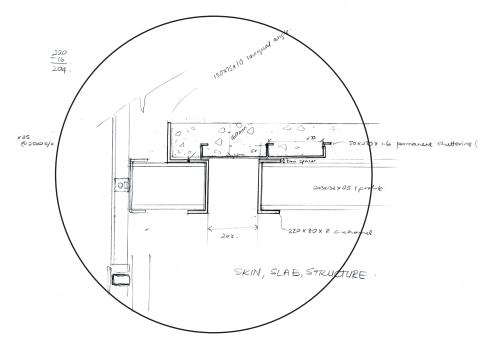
Bondlok fixed to I-profile joist (Author, 2016)
